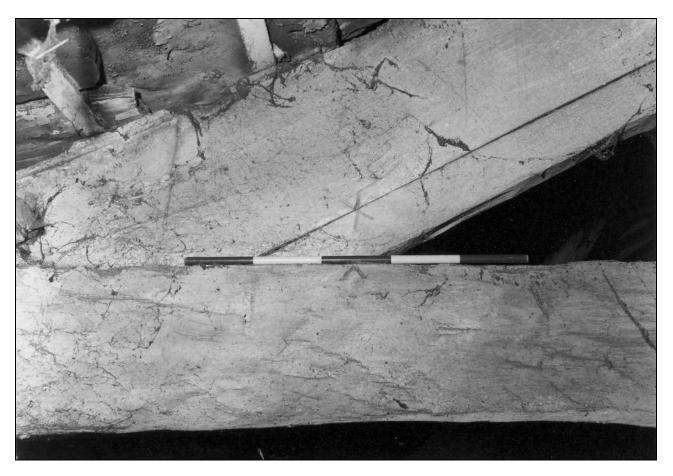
Detail of truss (type 1), with carpenter's marks "V", over milking parlour, from the south (film 1, frame 13)
